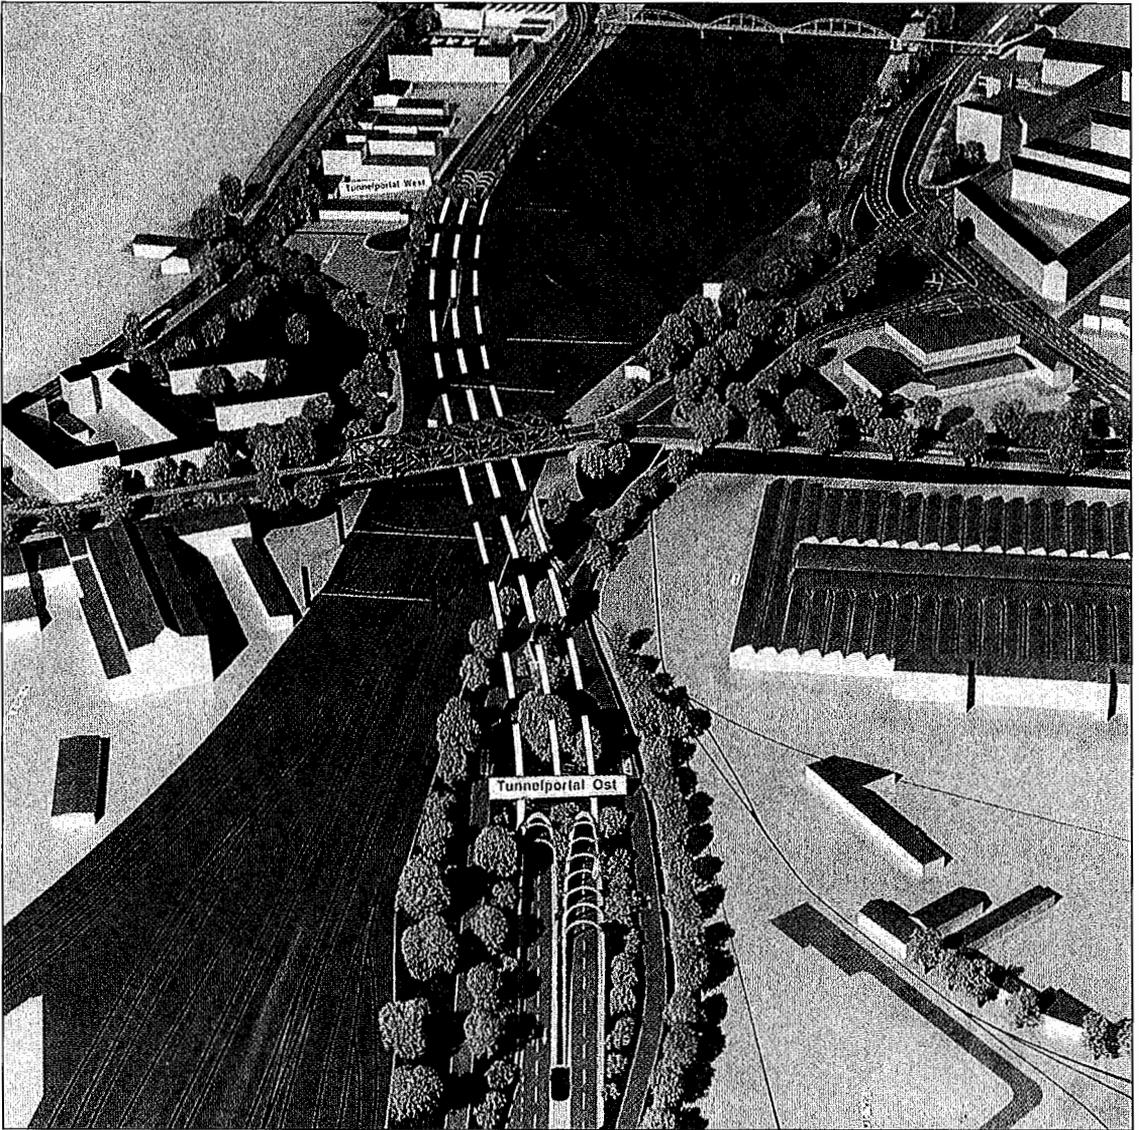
A model of the tunnel and railroad alignment for the Fahrlachtunnel project.
